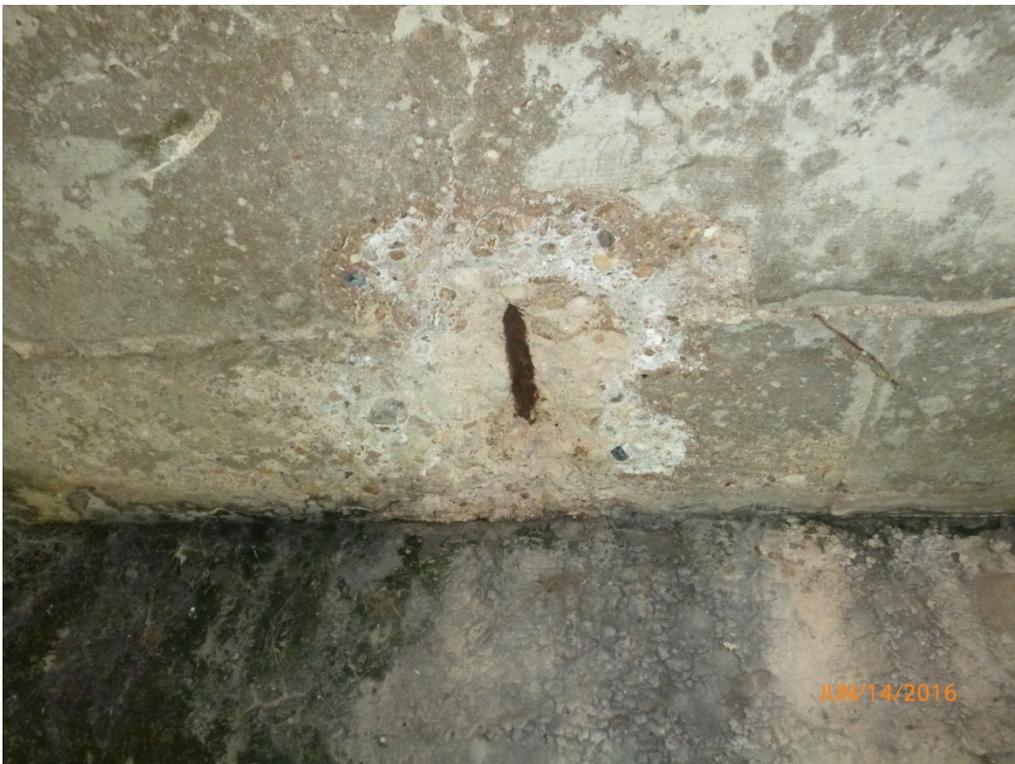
Spall in underside of Span 2 North Structure deck east of Floorbeam 11 directly over Arch Rib 2
